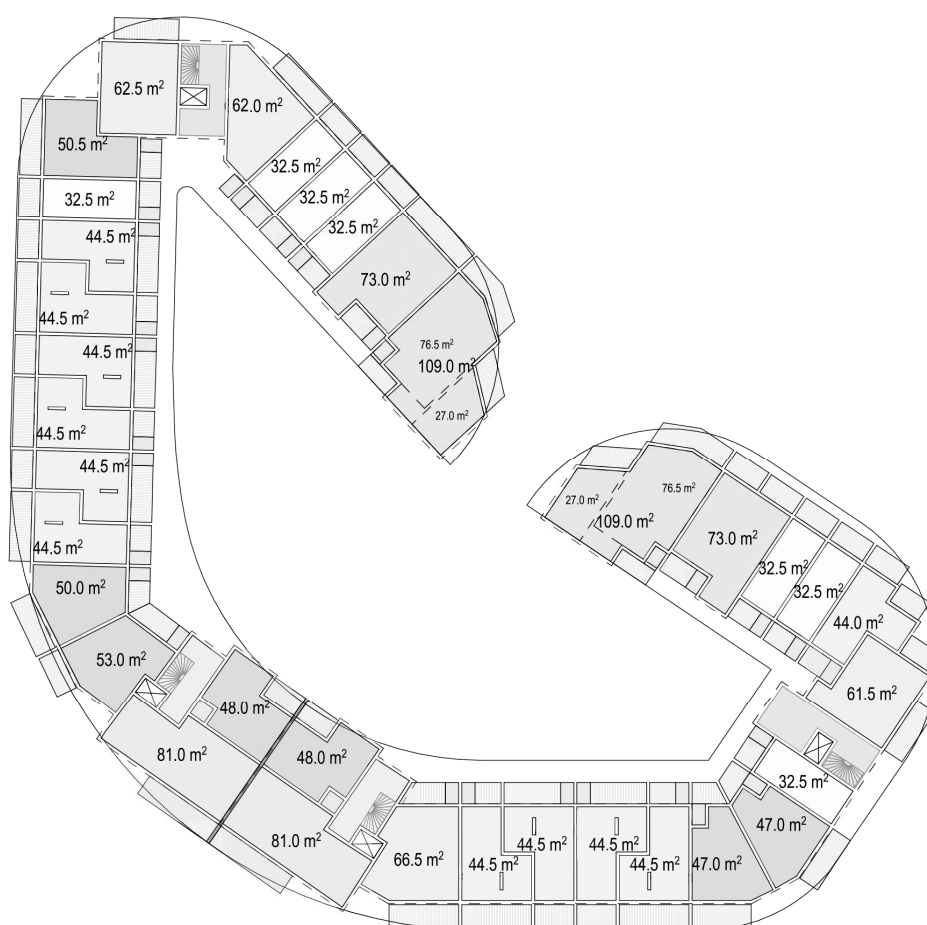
Apartment distribution diagram for the base floor of the studied apartment building (image by authors).
